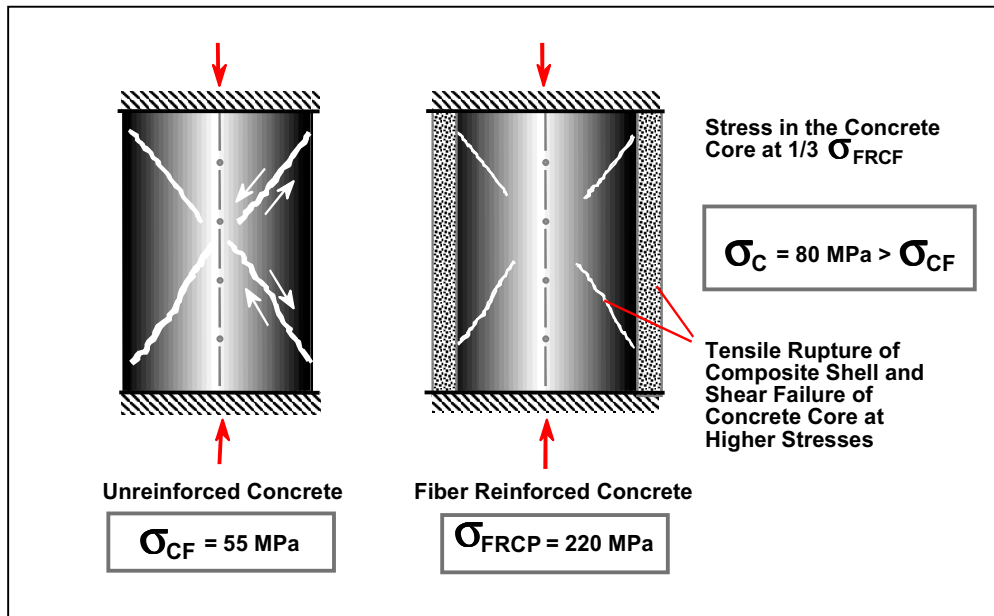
Schematic illustration of a failure prevention and strength enhancement of concrete columns by composite material wrapping.
